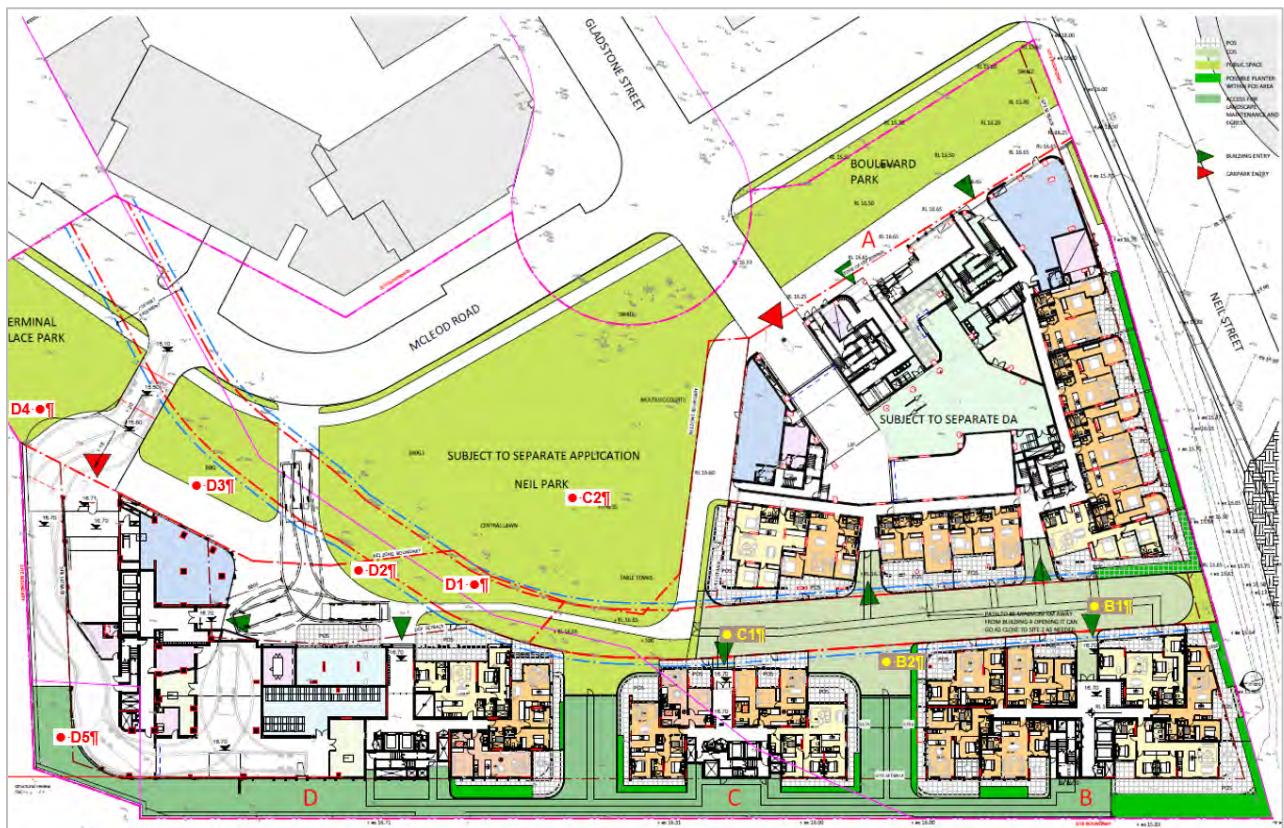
Proposed Ground Floor Layouts for Buildings B, C and D, Block D Site 2
